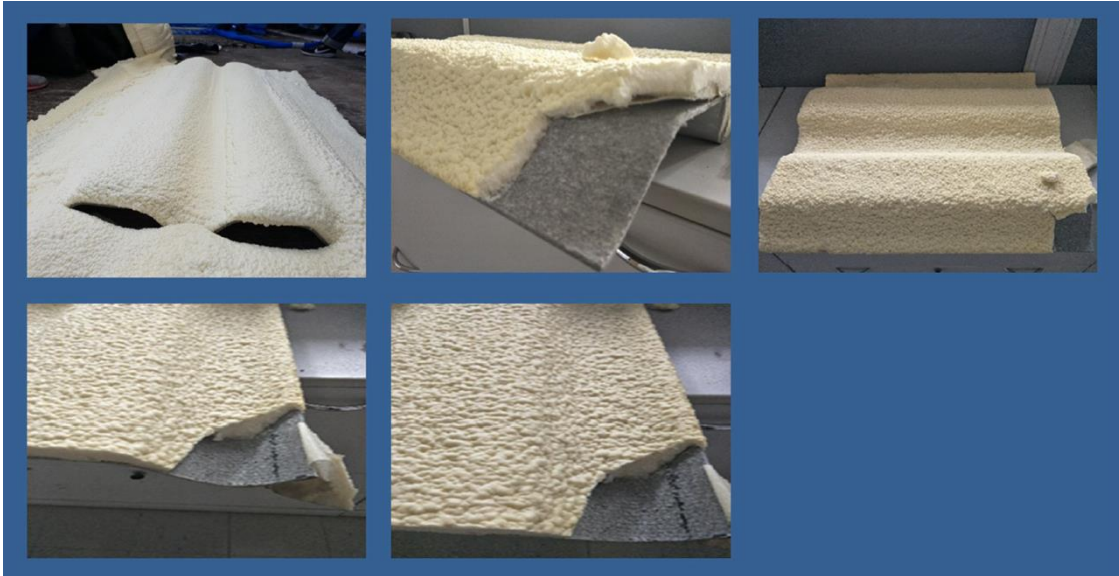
Hand-peeling tests for spray foam with a roof tile as substrate
